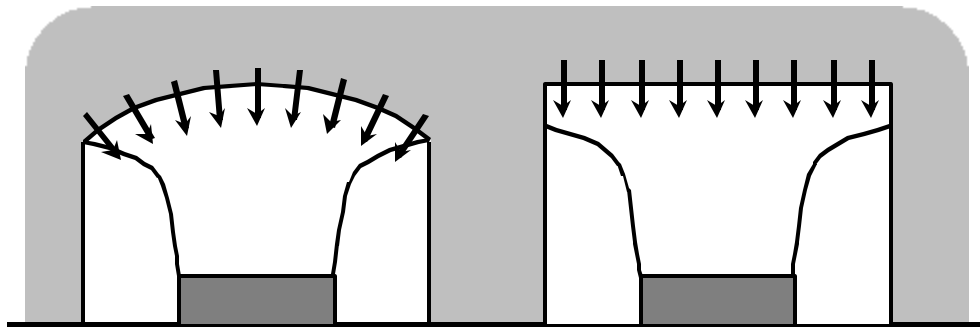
Re-radiated heat from the tunnel ceiling for concave and flat ceilinged tunnels
